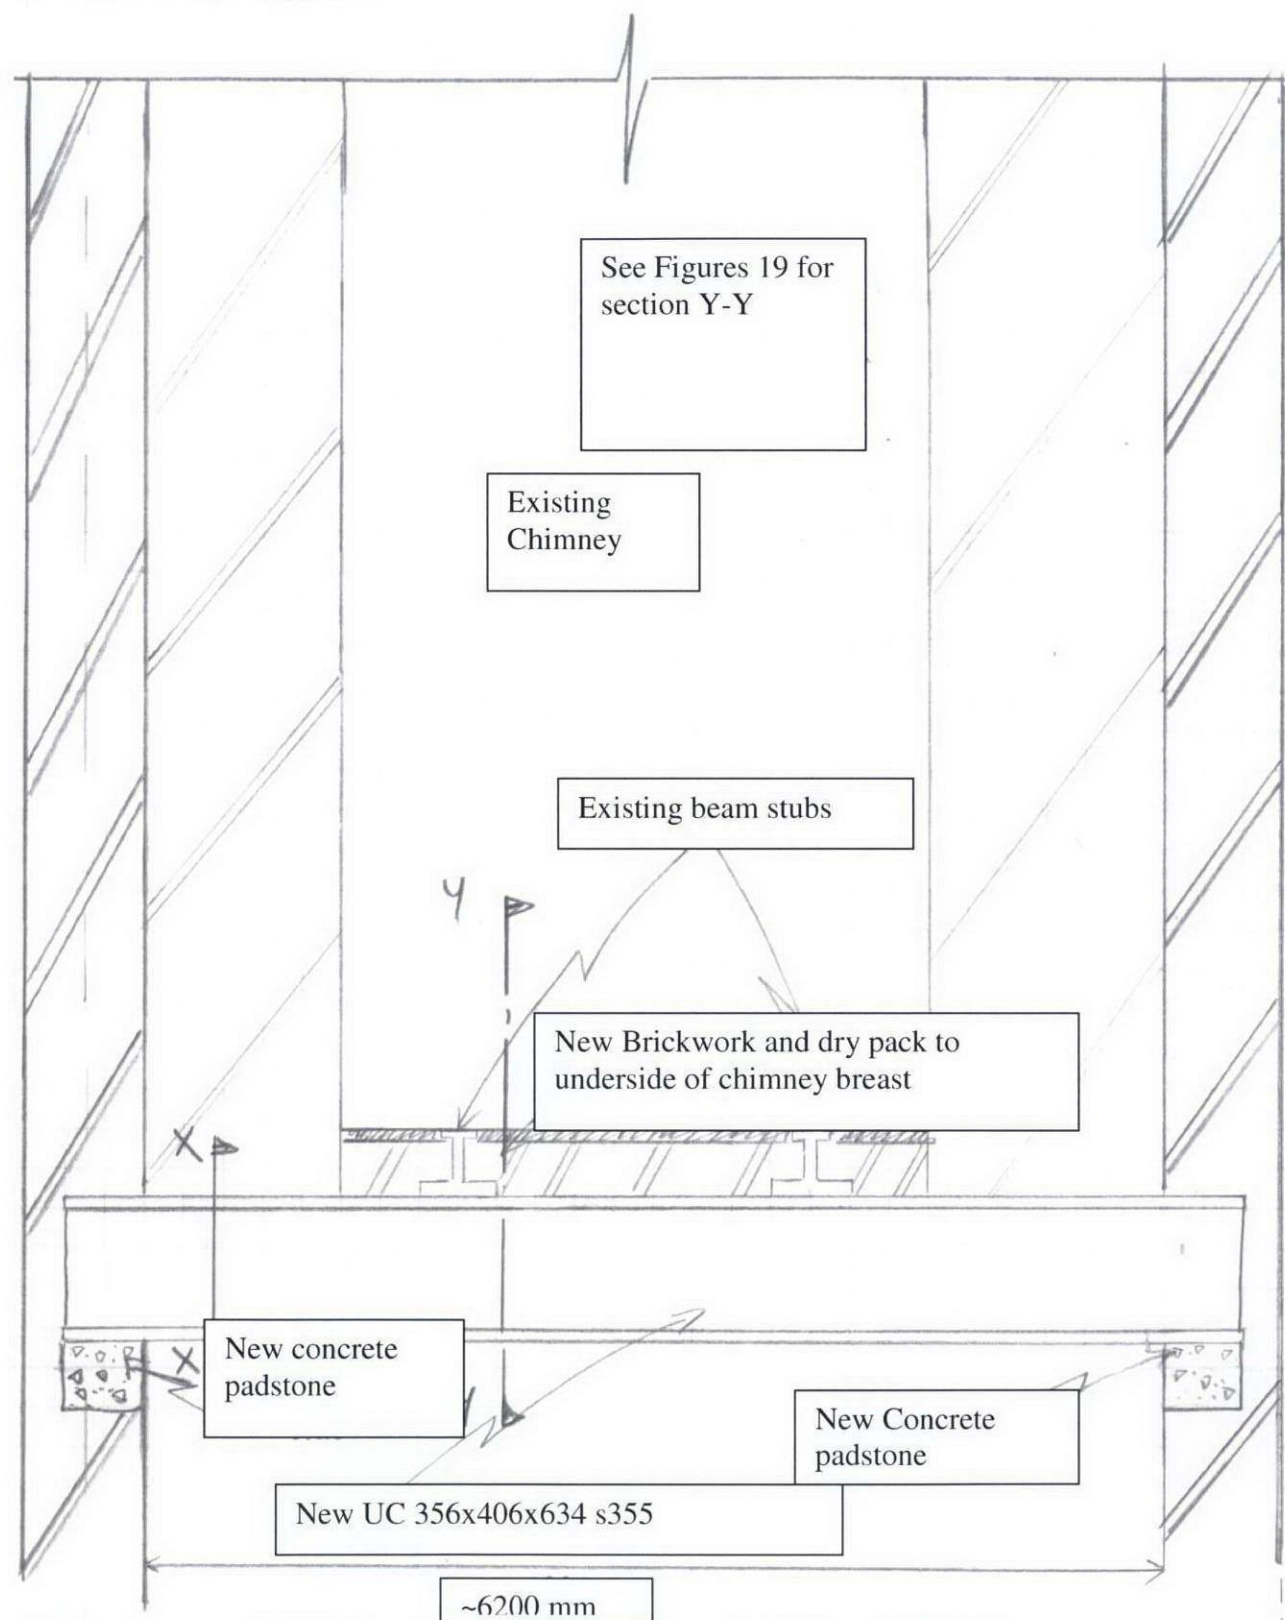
new support for chimney on gridline 10 1st floor (SK052)
